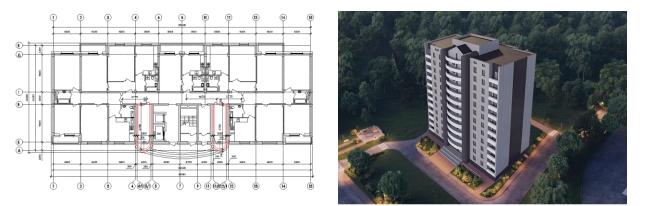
Integration of the safety capsule into the architectural and planning structure of a 12-story residential building
